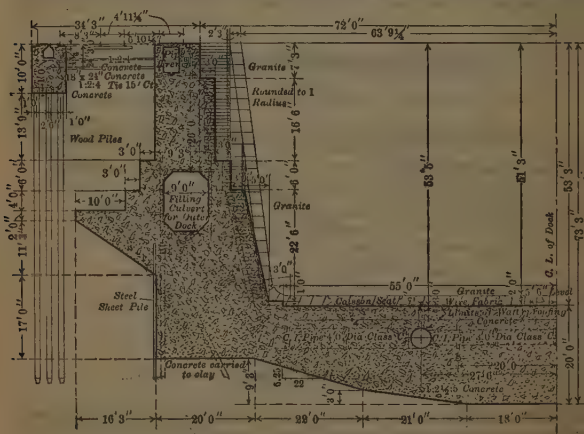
c*. Half Section Graving Dock, Philadelphia, Pa.
